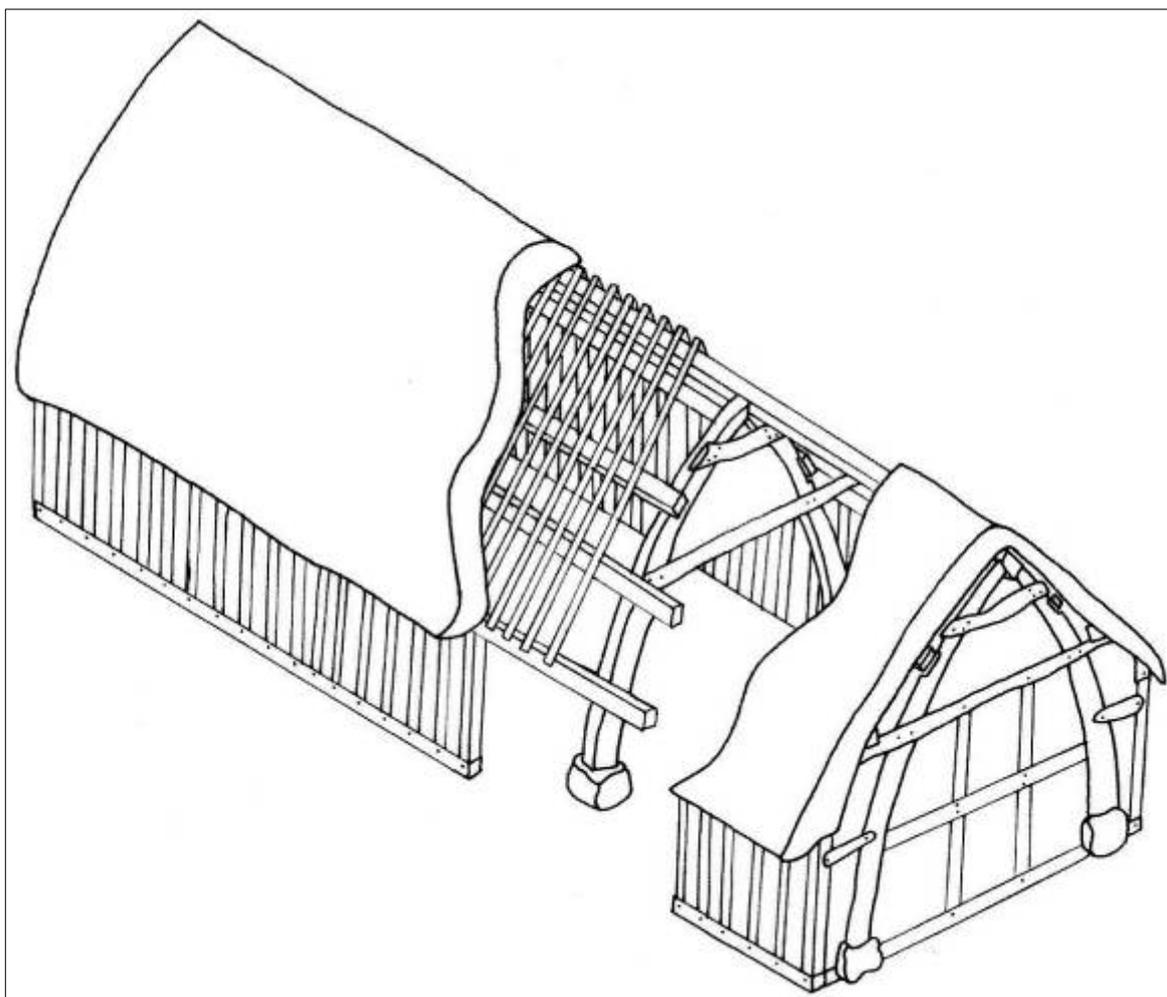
Reconstruction drawing of Building I (Drawn by the author)
